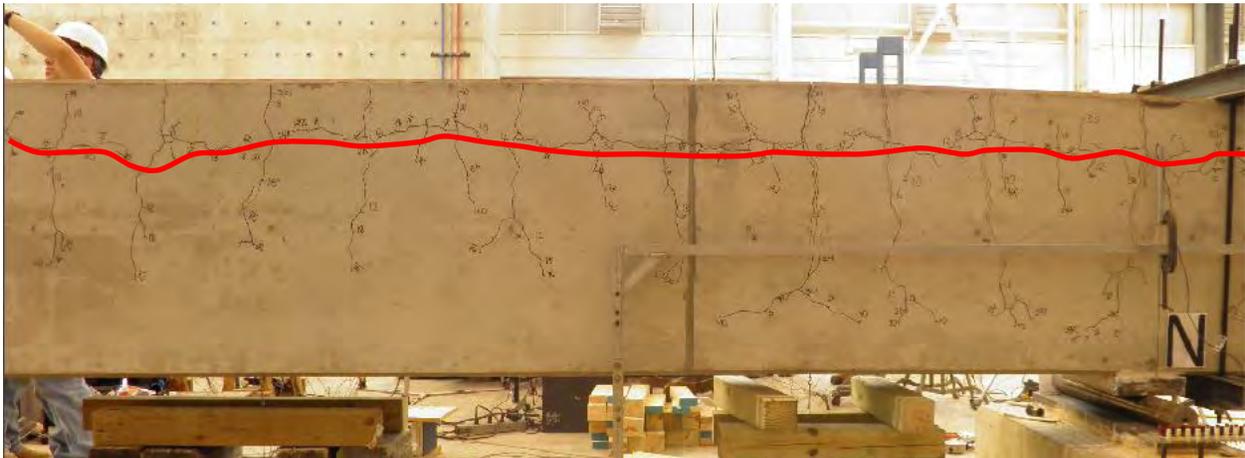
Typical Pattern of Flexural Cracks and Bursting Cracks Highlighted Resulting in Laminar Cracking (Purdue Testing)
